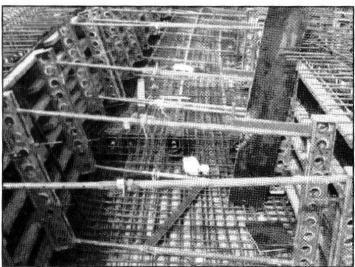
Typical View of Inner Bridge Formwork (M/s RMD Kwikform type)
